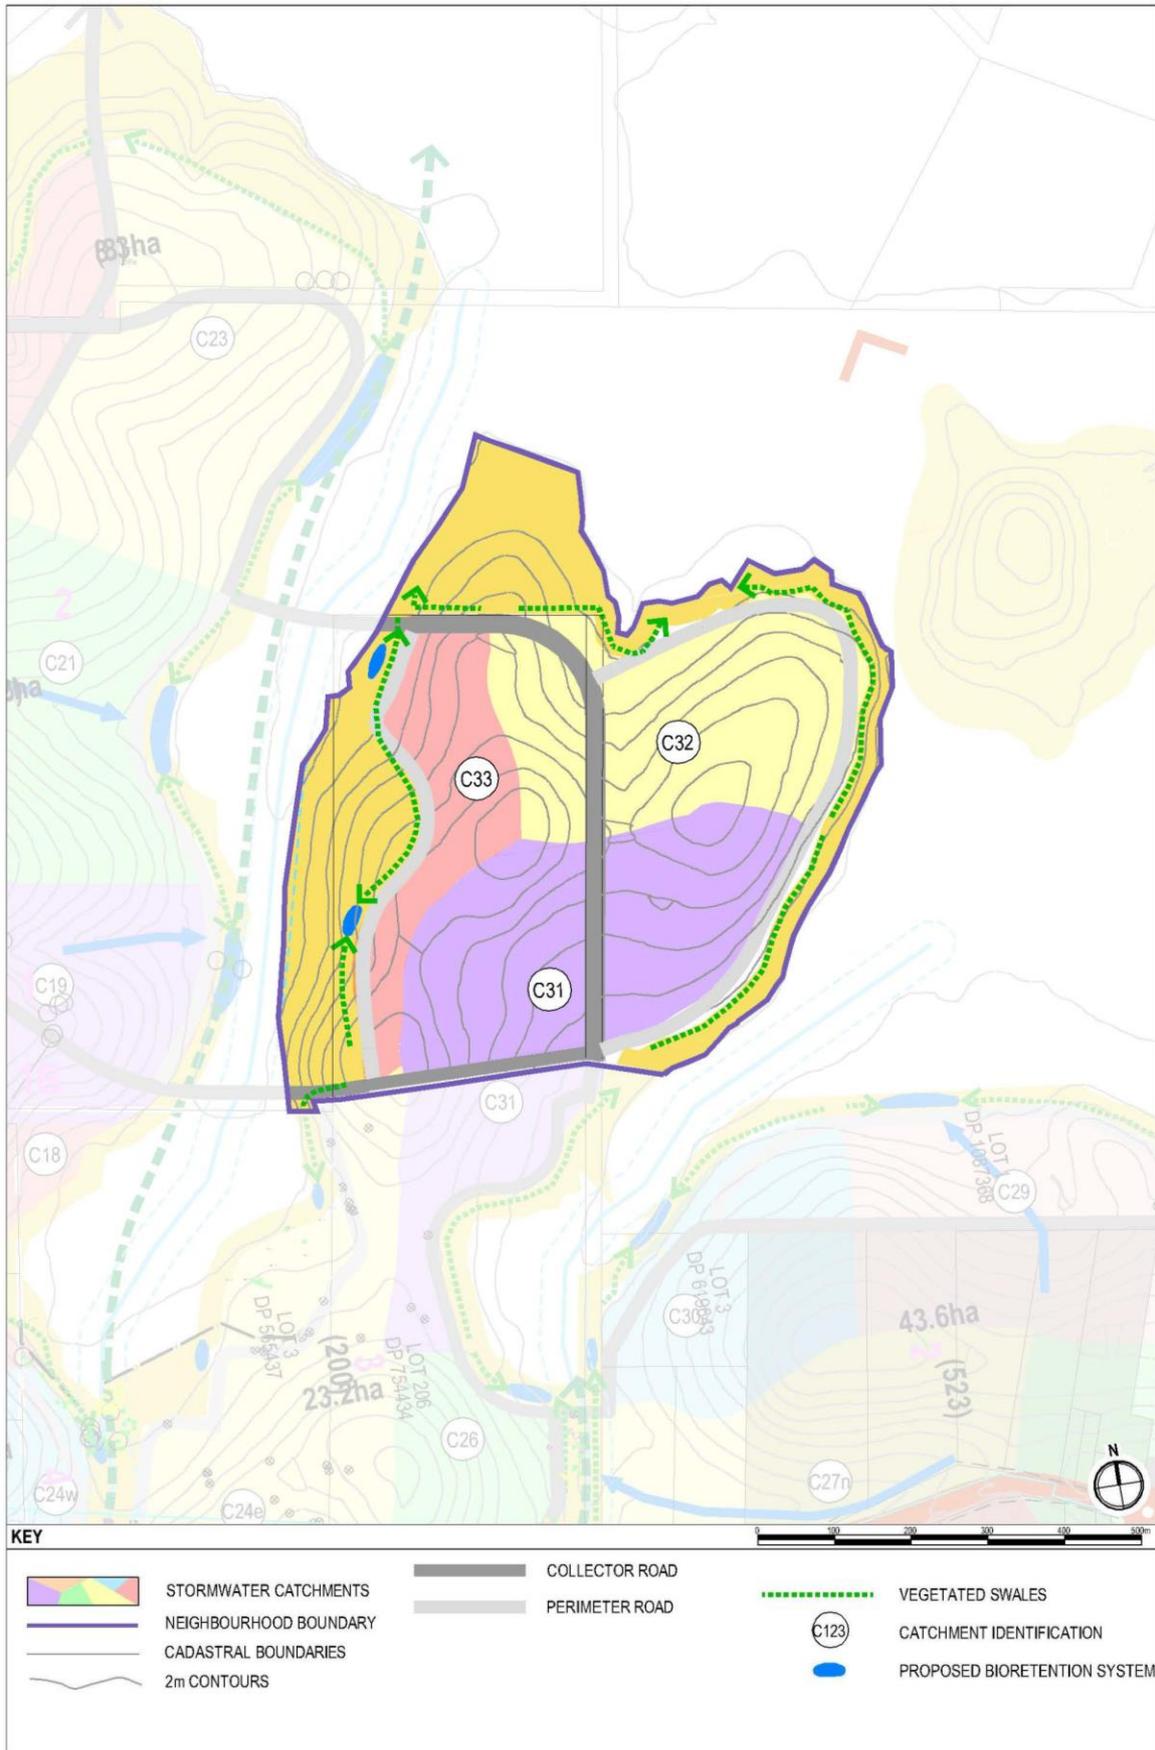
Partridge Creek Industrial Stormwater Management Plan
